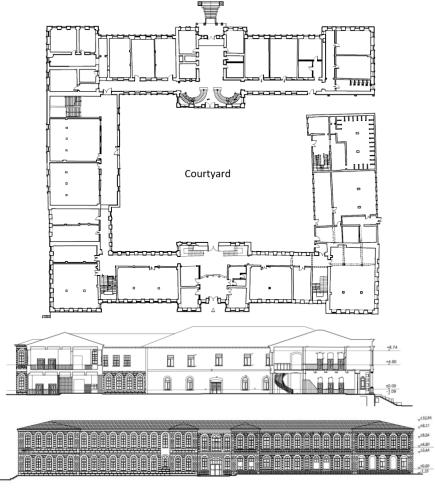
Old Harbiye Barracks ground floor architectural plan, section, and view
